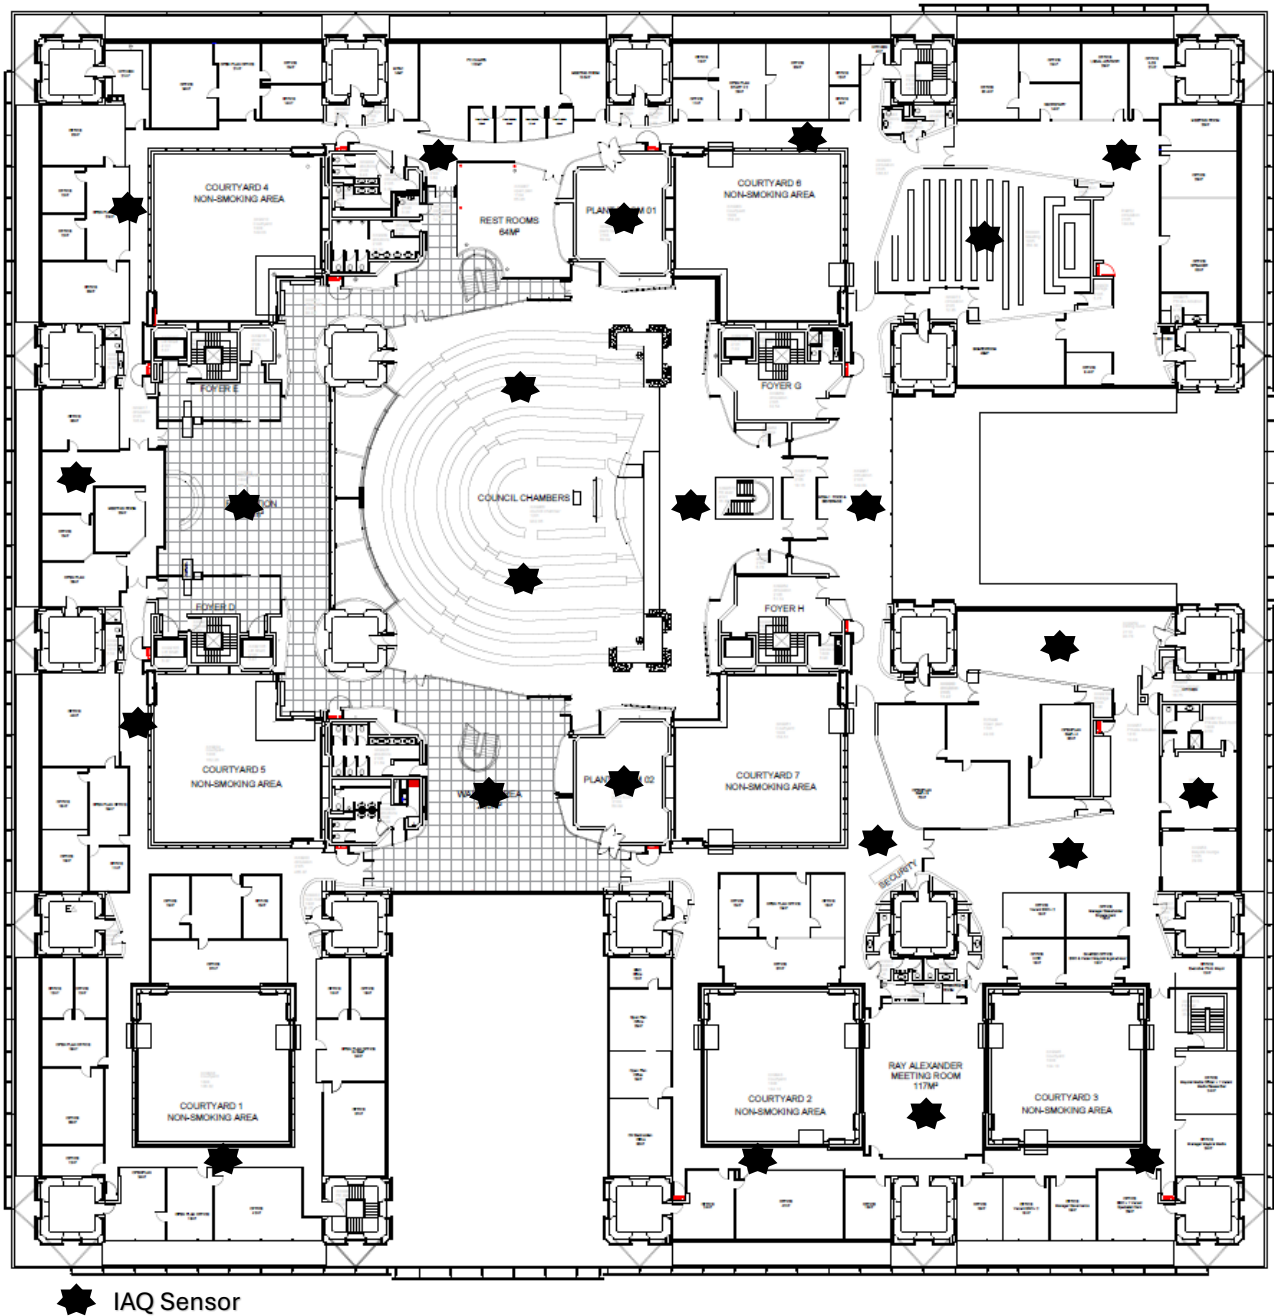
Podium Building proposed sensor positioning 6th floor (23)
